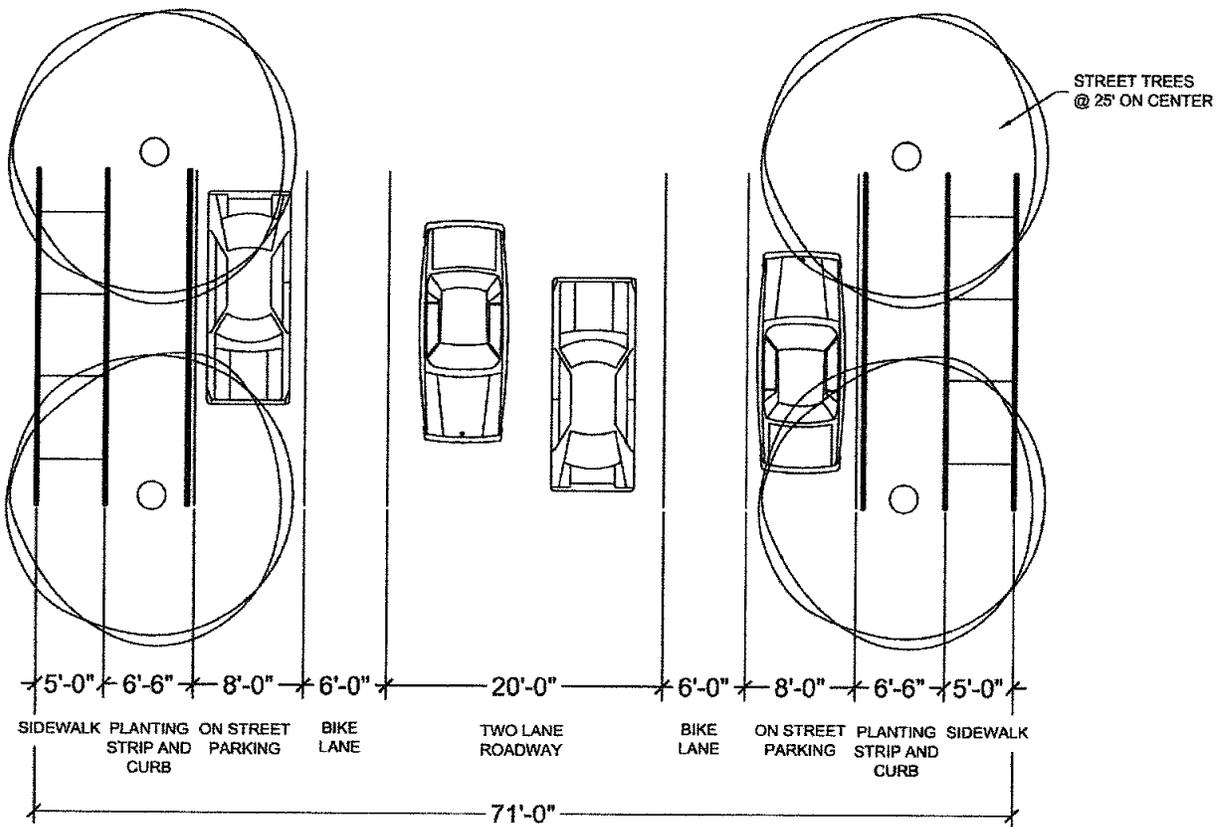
Typical Roadway Reconfiguration Outside of Downtown Core Area
